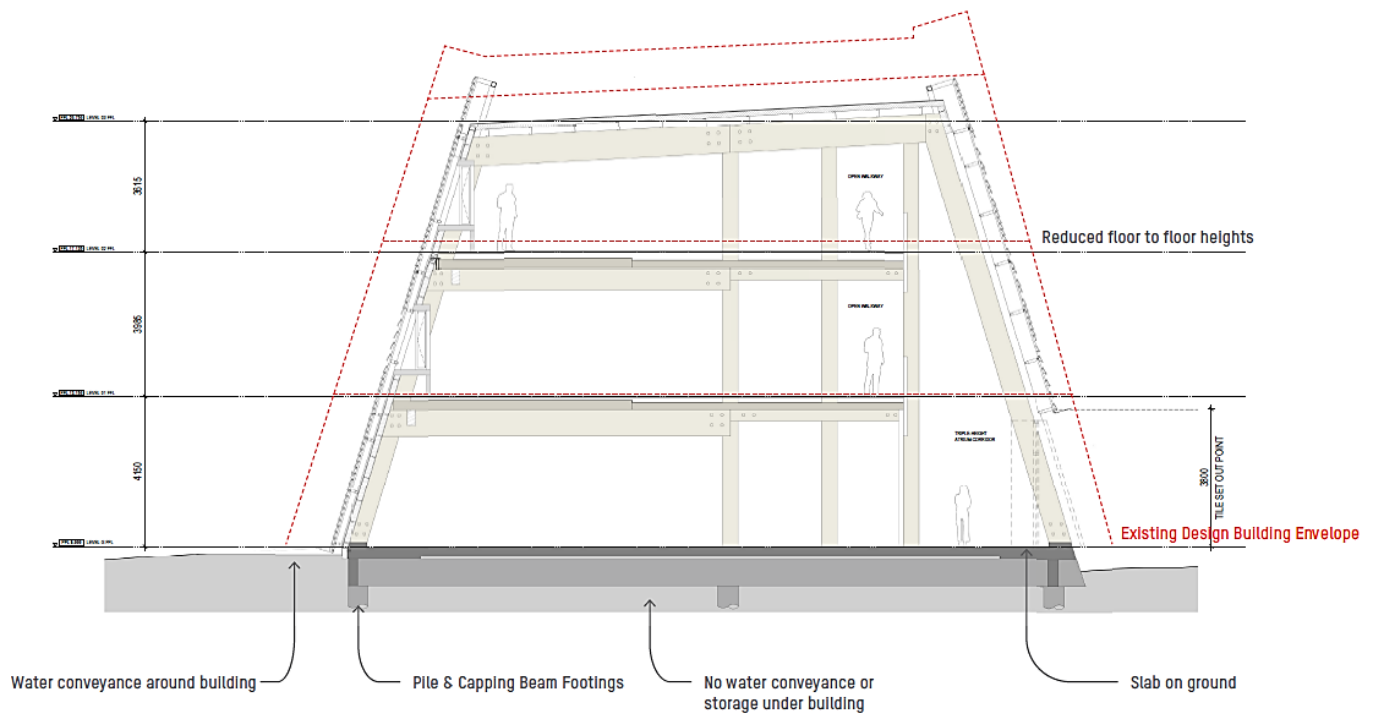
Typical building section, with the existing building envelope and floor to ceiling heights shown in red dashed line.
